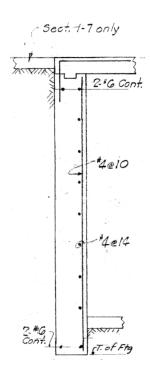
Section through Typical Retaining Wall at Level Step ups, sect. 1-7 on S1
